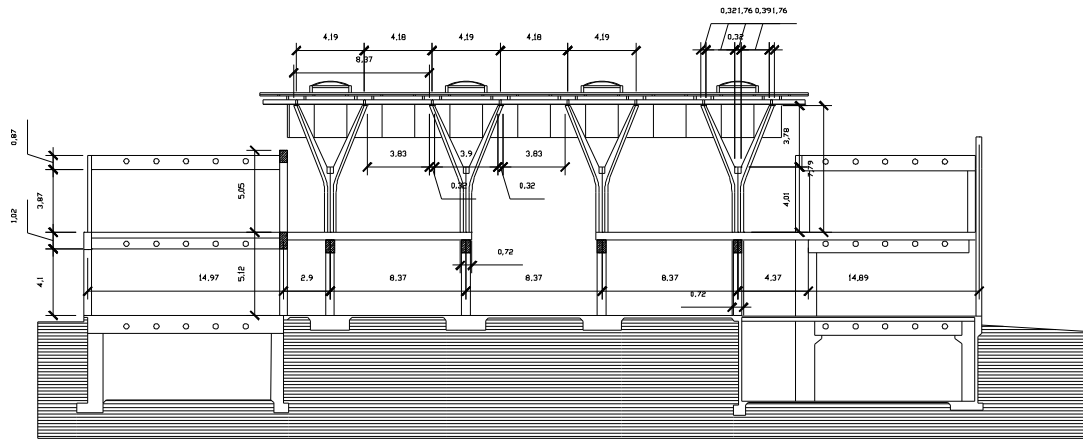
Section of Beaverton Library – the tree-like structure emerge only on the second floor.
